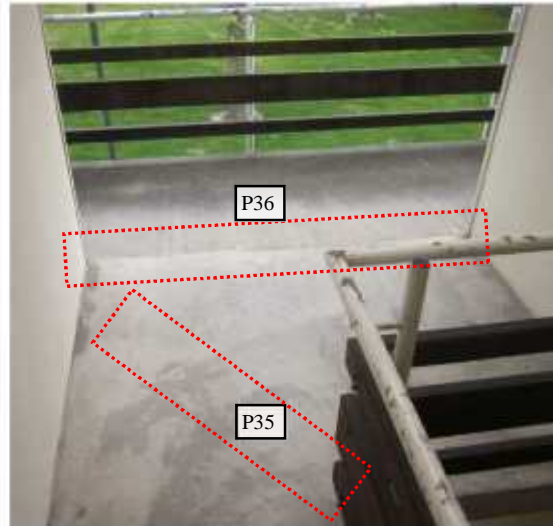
Block D - Cracks in concrete slab - upper floor balcony.
